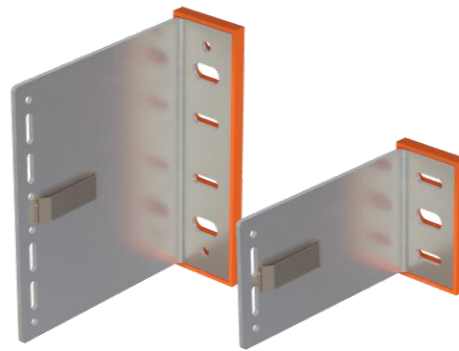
Typical RJ Facade System - EVT II support structure assemblies for supporting Briklok profiles
